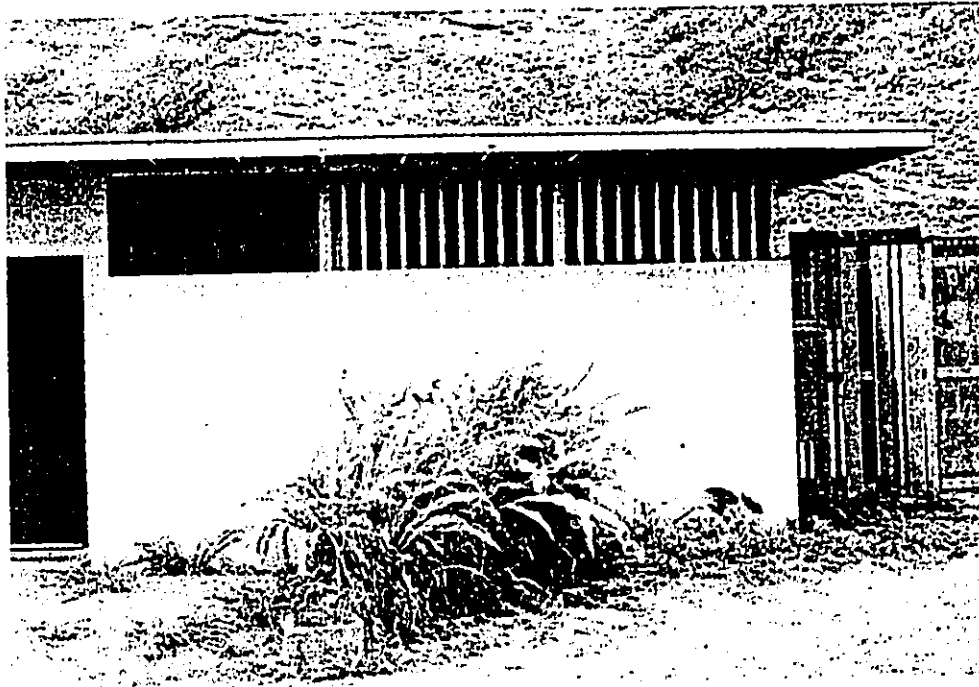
Top: North Wall of Building Showing Vents, View to South.
